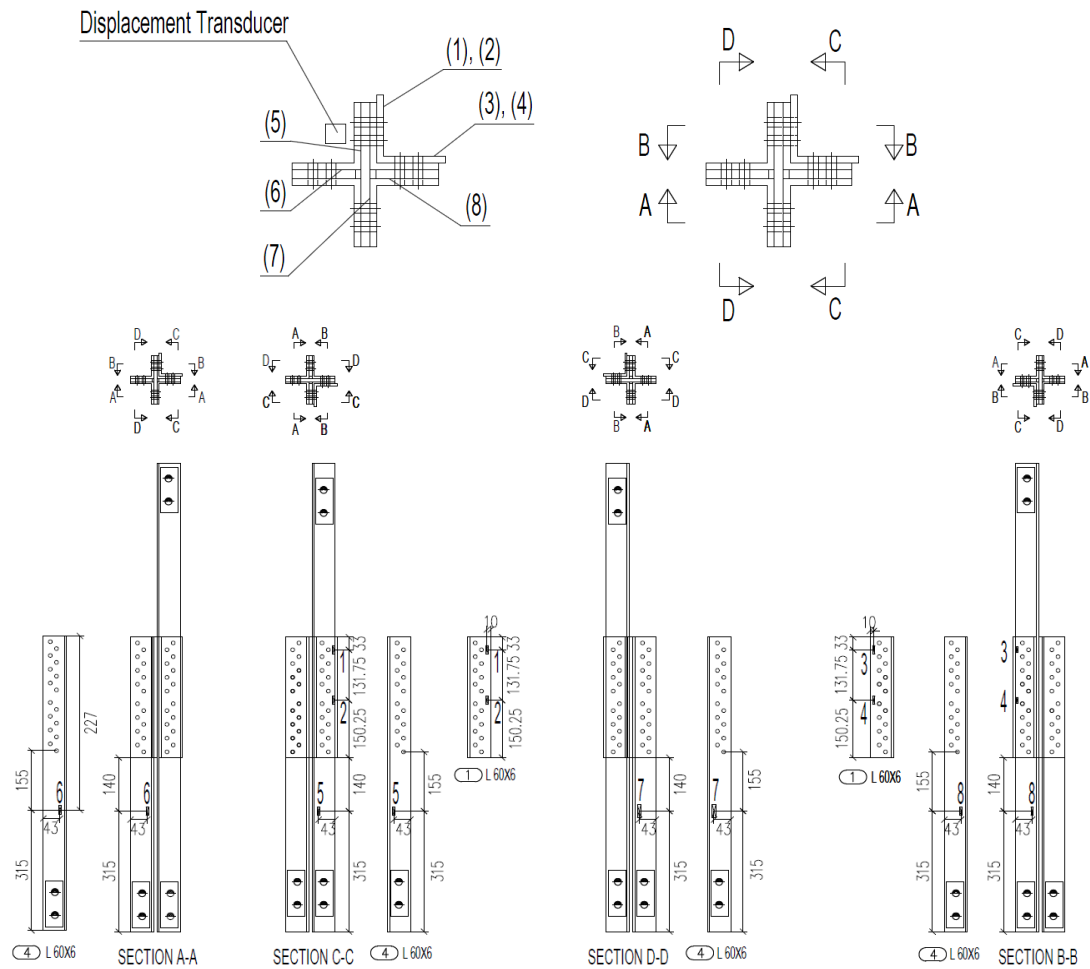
Strain gage and displacement transducer locations in side and cross-sectional view of Specimen-2 (dimensions in mm unit)
